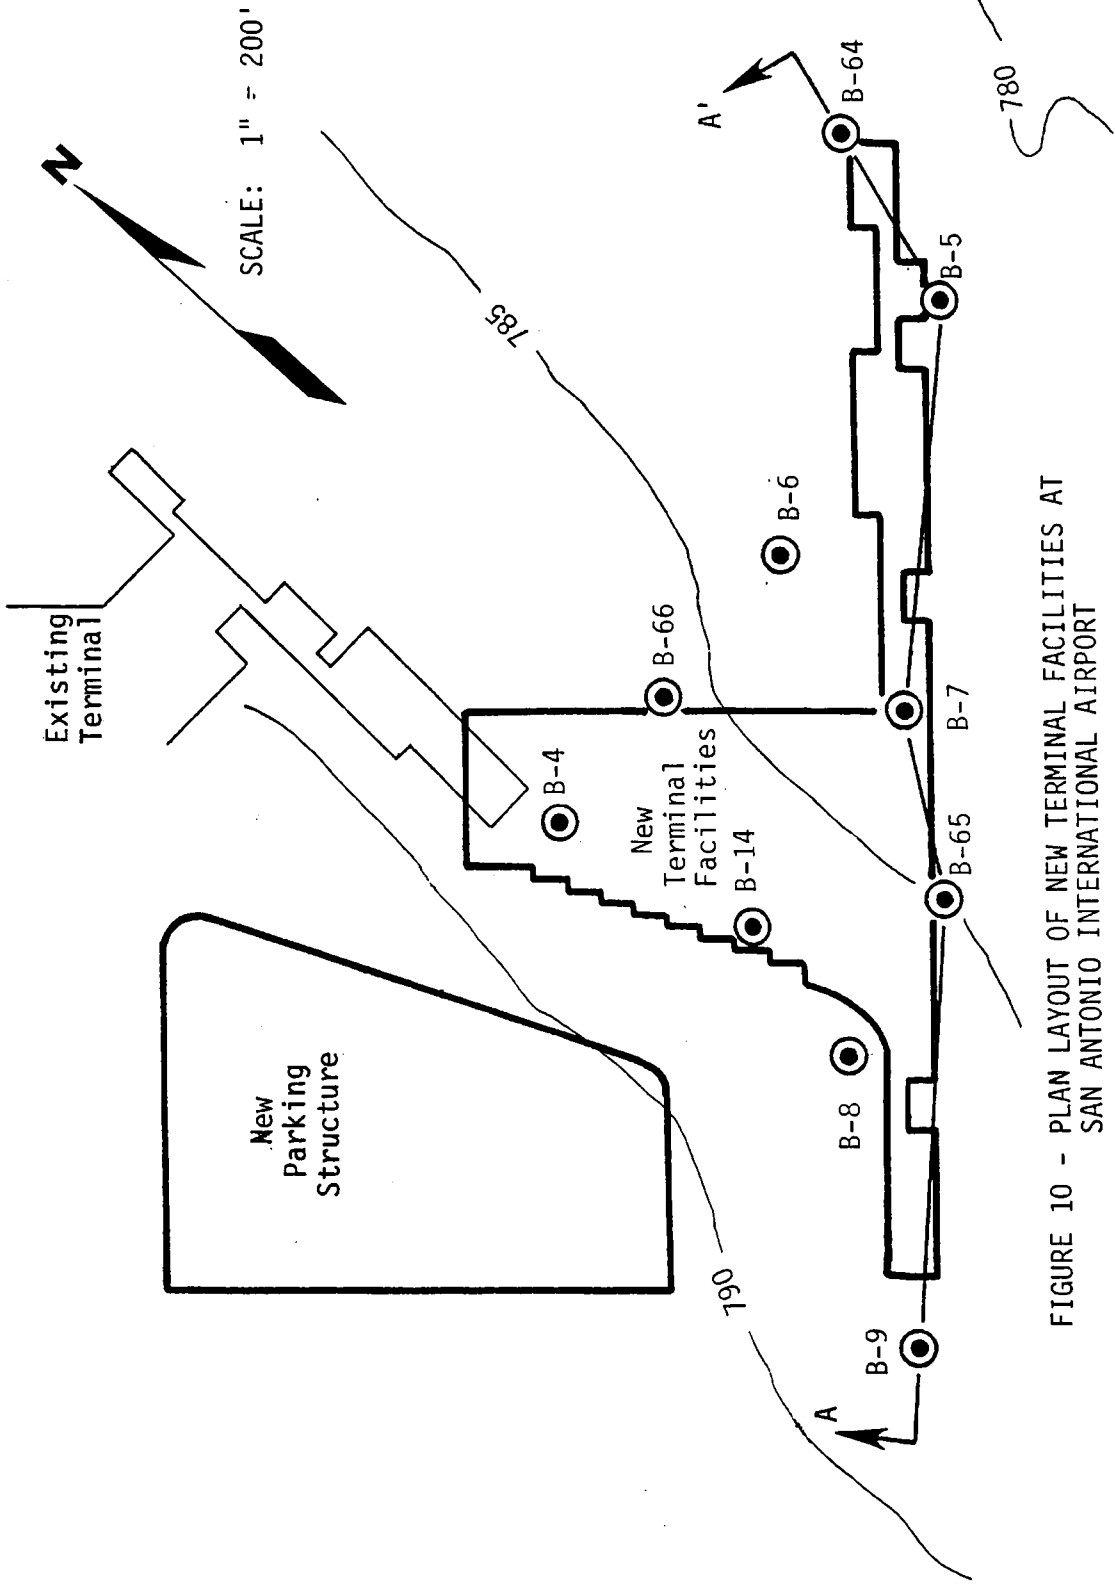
PLAN LAYOUT OF NEW TERMINAL FACILITIES AT SAN ANTONIO INTERNATIONAL AIRPORT
